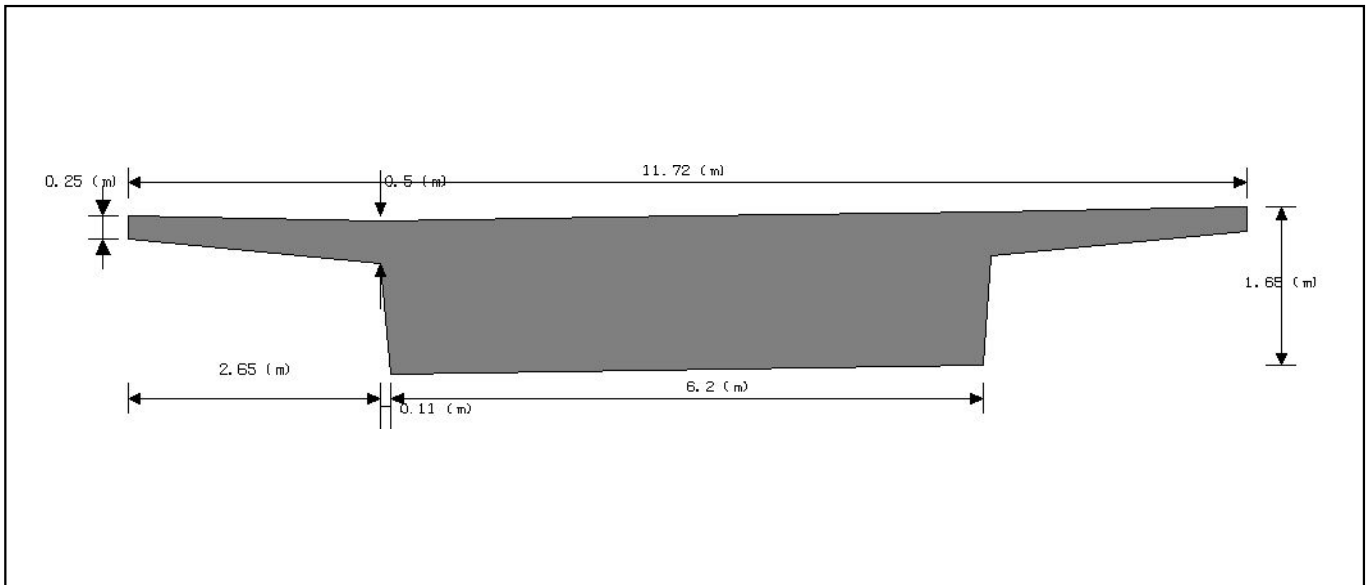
Down station view for Span03 cross section - Station 0.0 .
